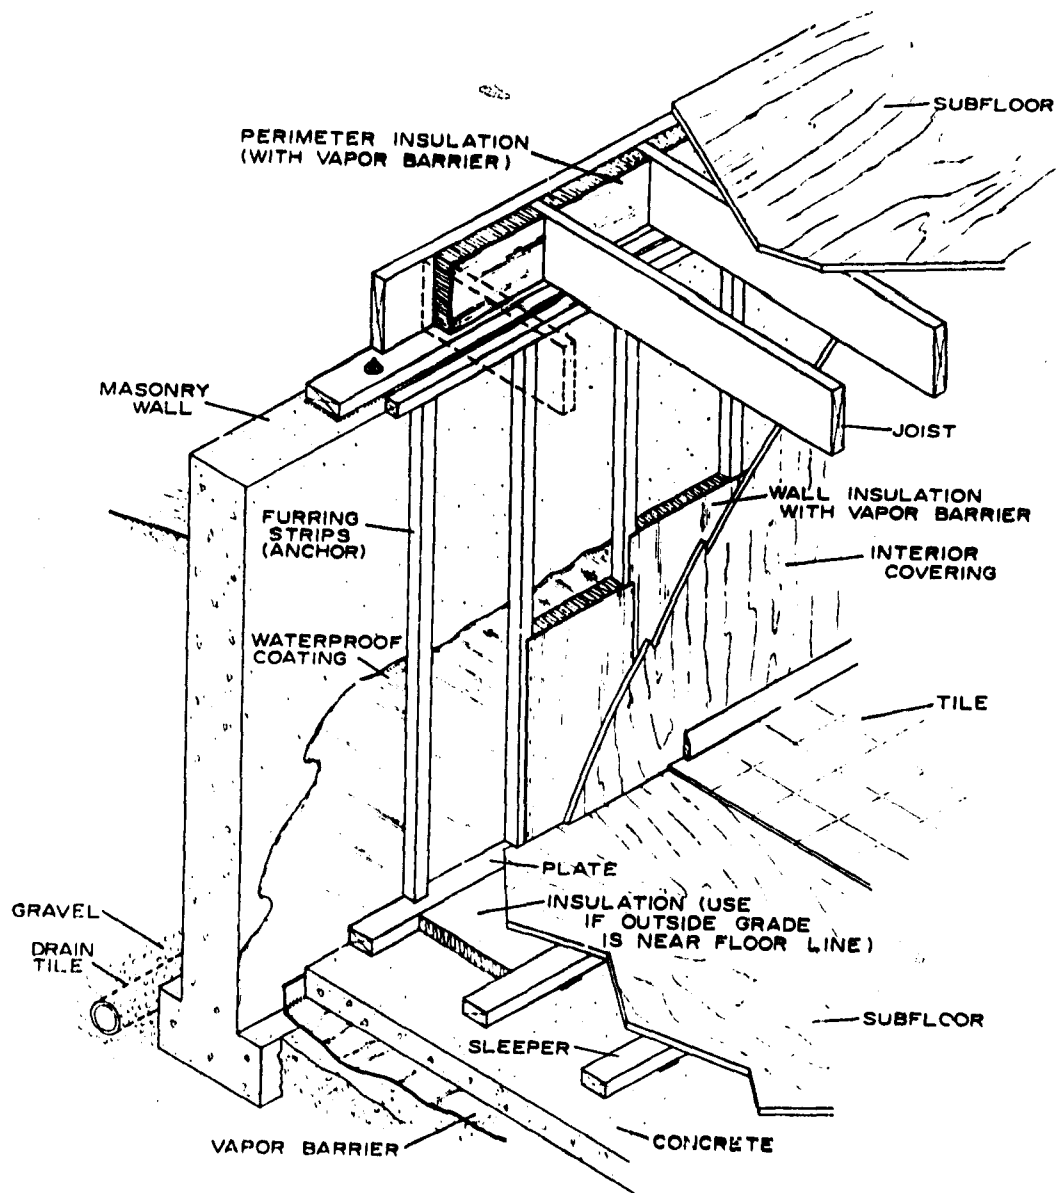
Installing vapor barrier in floor and wall of finished basement. M 139 216
